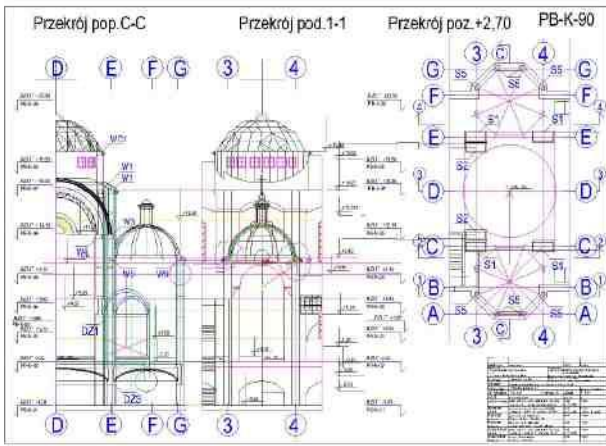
Cross-sections of octagonal side chapel covered by masonry dome with reinforced-concrete ribs, PB-K-90a, A2.
